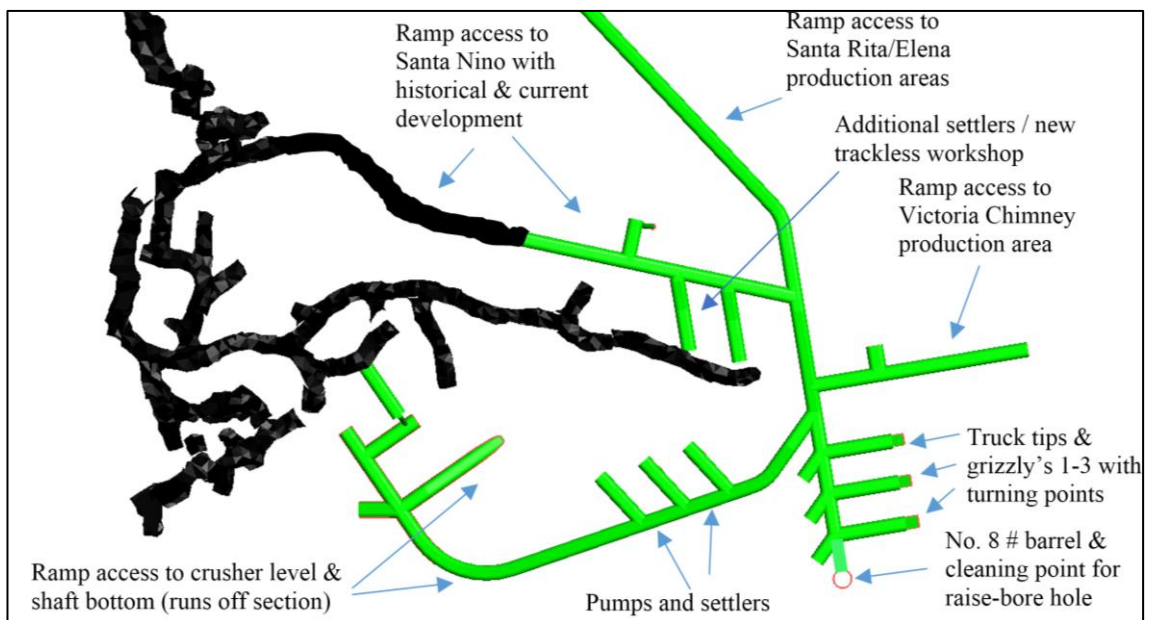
Plan view of 3250L showing the positions of the No. 8 shaft, truck tips, pumping chambers/settlers and shaft access ramps
